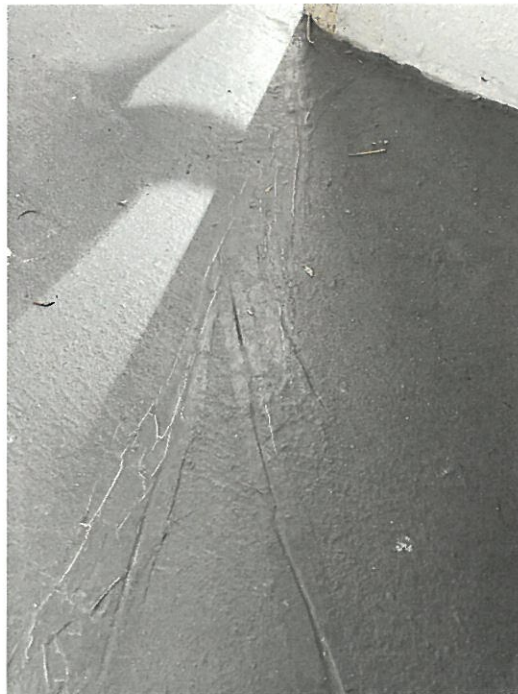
Previously Repaired Cracks within Stairwell
